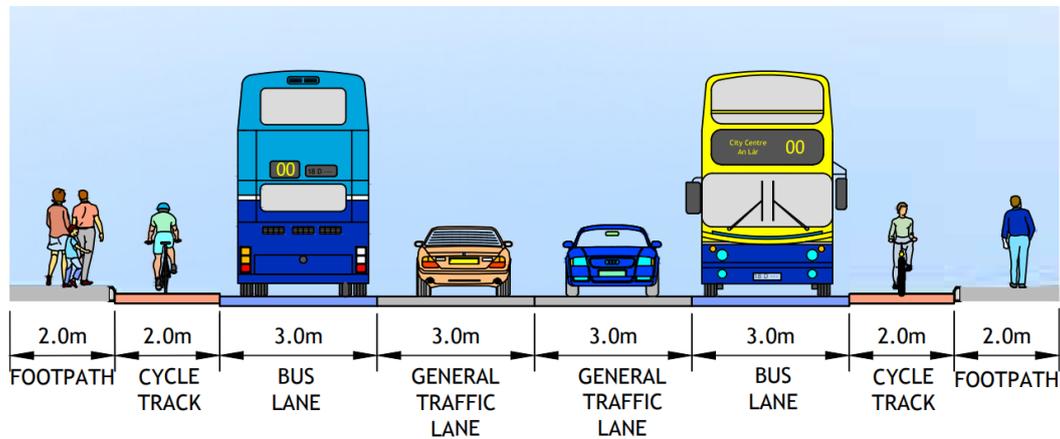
Cross-Section B-B (relevant to RG1, RG3 & RG5)
